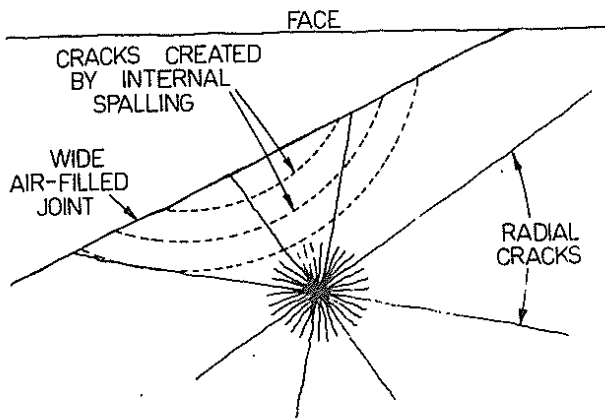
Termination of radial cracks and creation of internal spalling cracks at wide air-filled joint.
